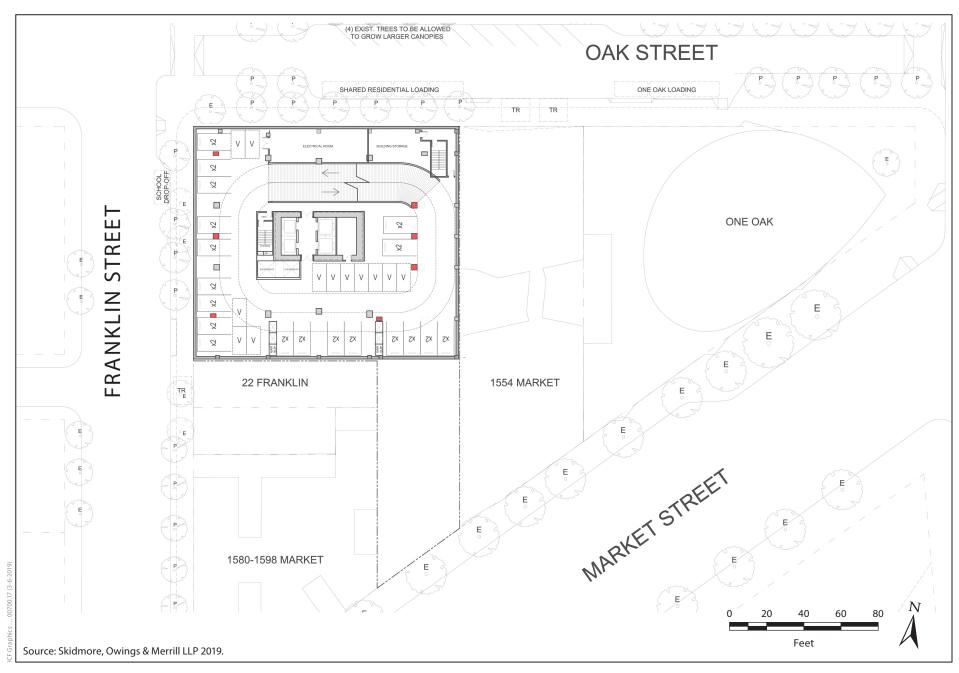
98 Franklin Street Project – Proposed Basement Level 2 and 3 Plan
